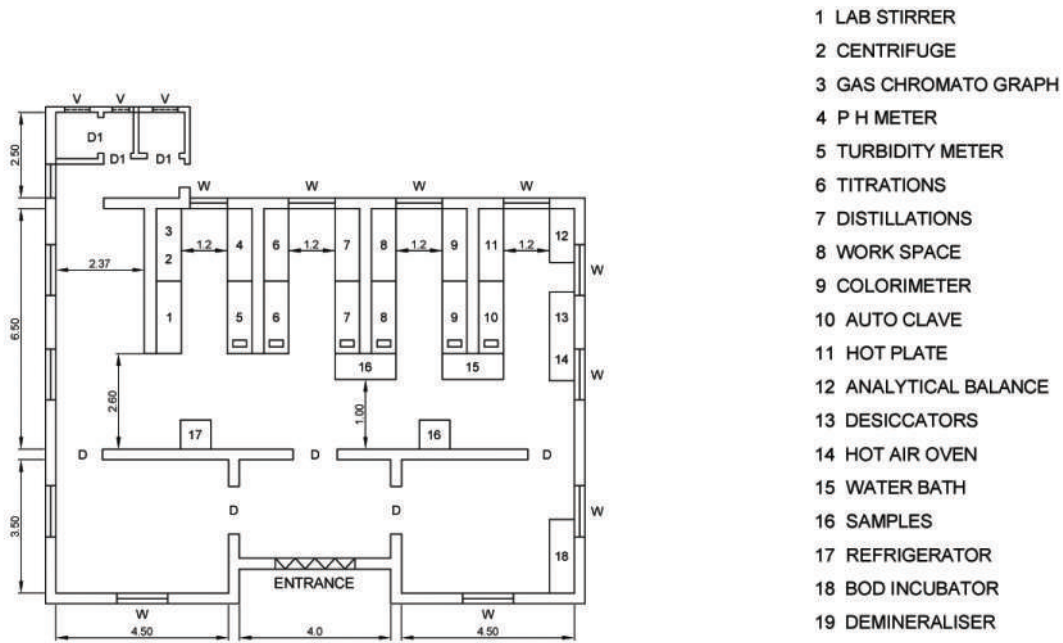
Typical layout and list of equipments for sewage treatment plant control laboratory
